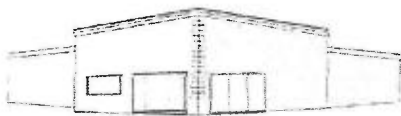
NO. Building design that does not include details to scale down entrances, roofs or wall size, and does not reflect Vermont's historic, rural architecture does little to complement a scenic rural landscape.
